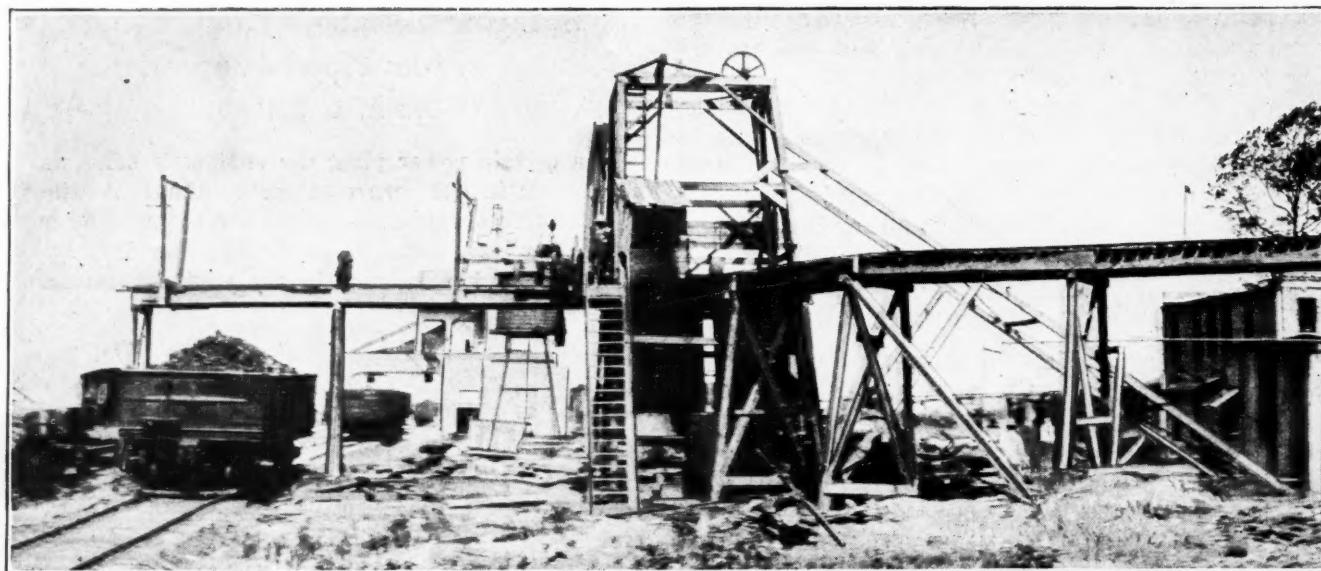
AND 2. SWINGING BRACKET AND DETAILS OF ARRANGEMENT
